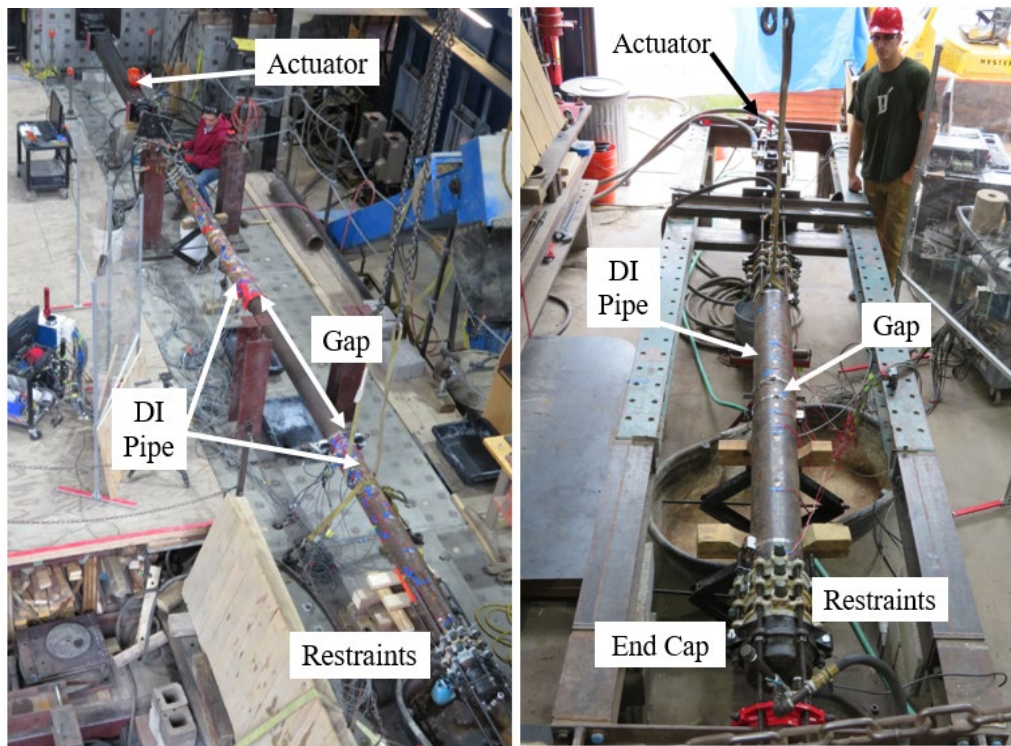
Large Load Frame (Facing North) Figure 3.4. Small Load Frame (Facing South)
